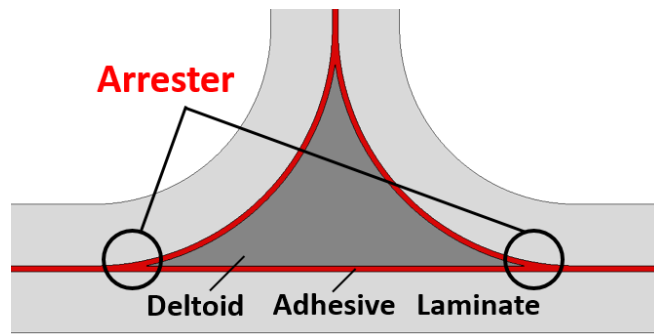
Arrester position of specimen used in tensile tests in section 5.1.
